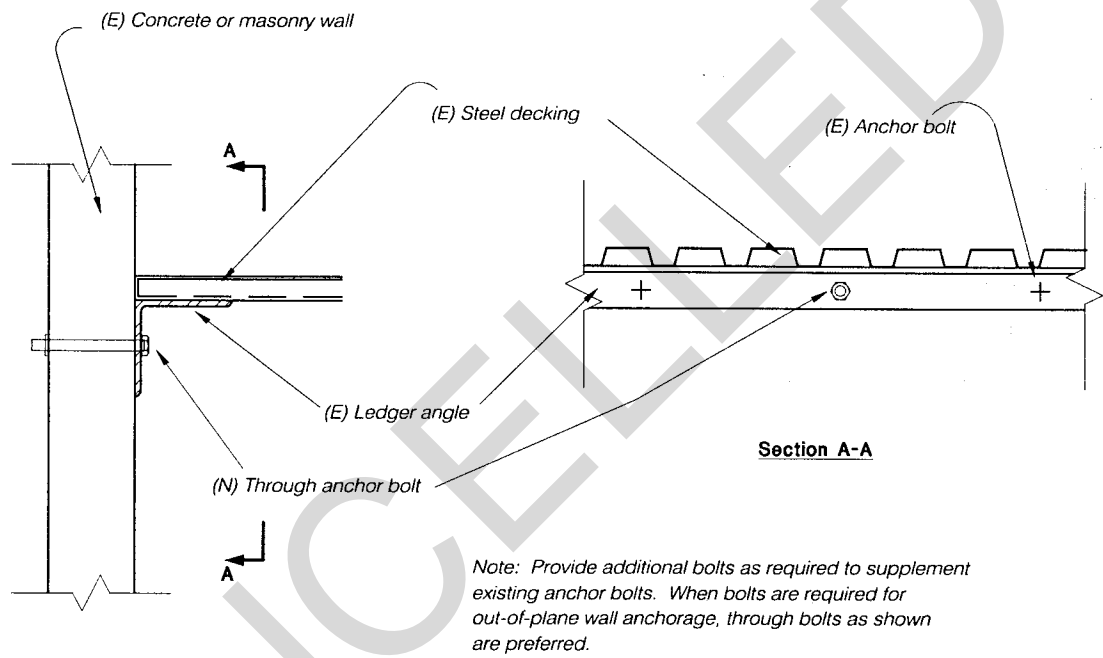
Strengthening Steel Decking Support for Shear Transfer and Wall Anchorage
